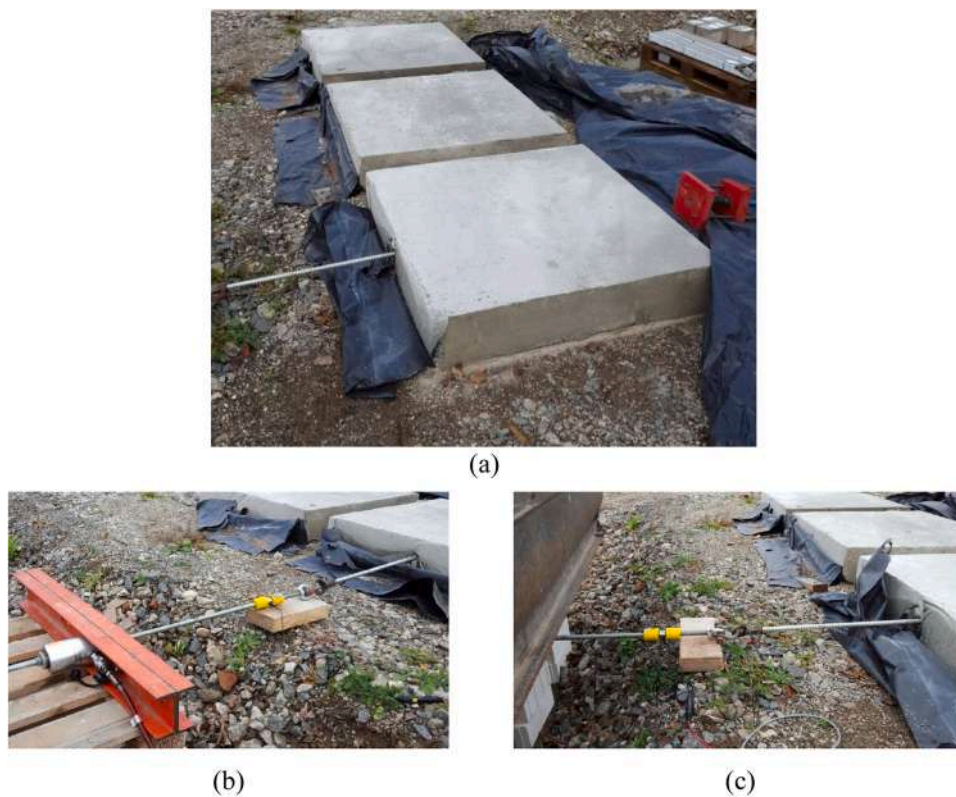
Three square slab specimens before testing (a), hydraulic jack and a steel beam for applying in-plane horizontal load (b), anchoring system (c).
